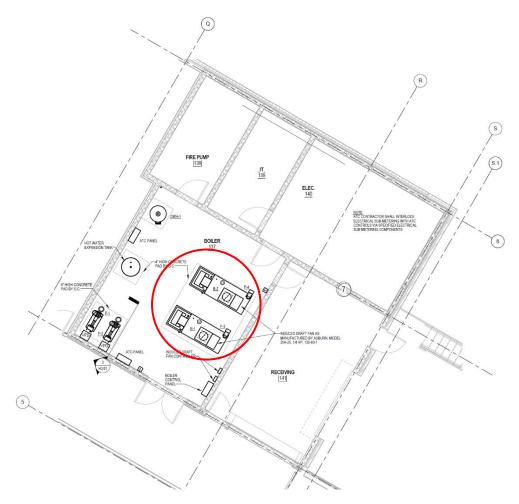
EXISTING BOILER ROOM LAYOUT.
